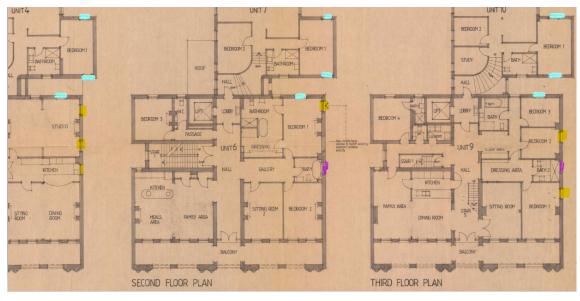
Screenshot of floor plans showing the first, second and third floor east facing habitable room windows of the Biltmore highlighted. Yellow highlight denotes six habitable room windows. Purple highlight denotes non-habitable room windows. Blue denotes windows that are not east facing. Source: Endorsed plans of the Biltmore Building, Planning permit S3378. 23 July 1993. NB: a discrepancy exists as one surveyed window at second floor is not shown on the endorsed plans.
